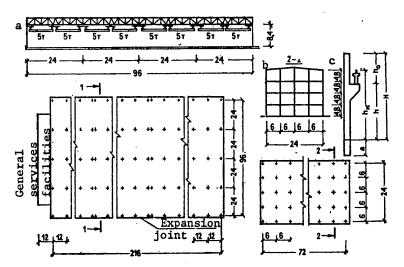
Dimensioned layouts of an industrial building. a--One-story; b-multistory; c--column dimensions.
